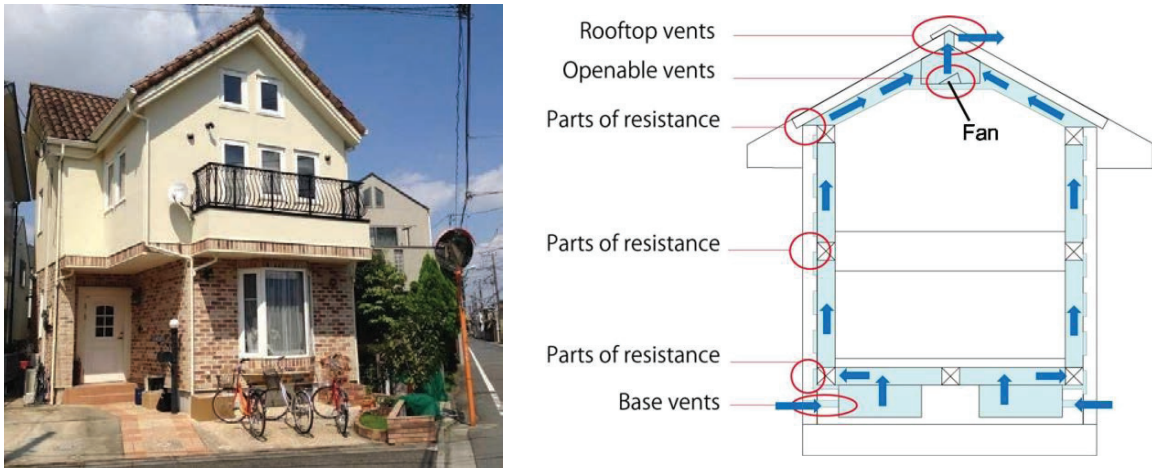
Outside view and ventilated wall of the experimental house: (a) outside view, (b) Ventilated wall.
